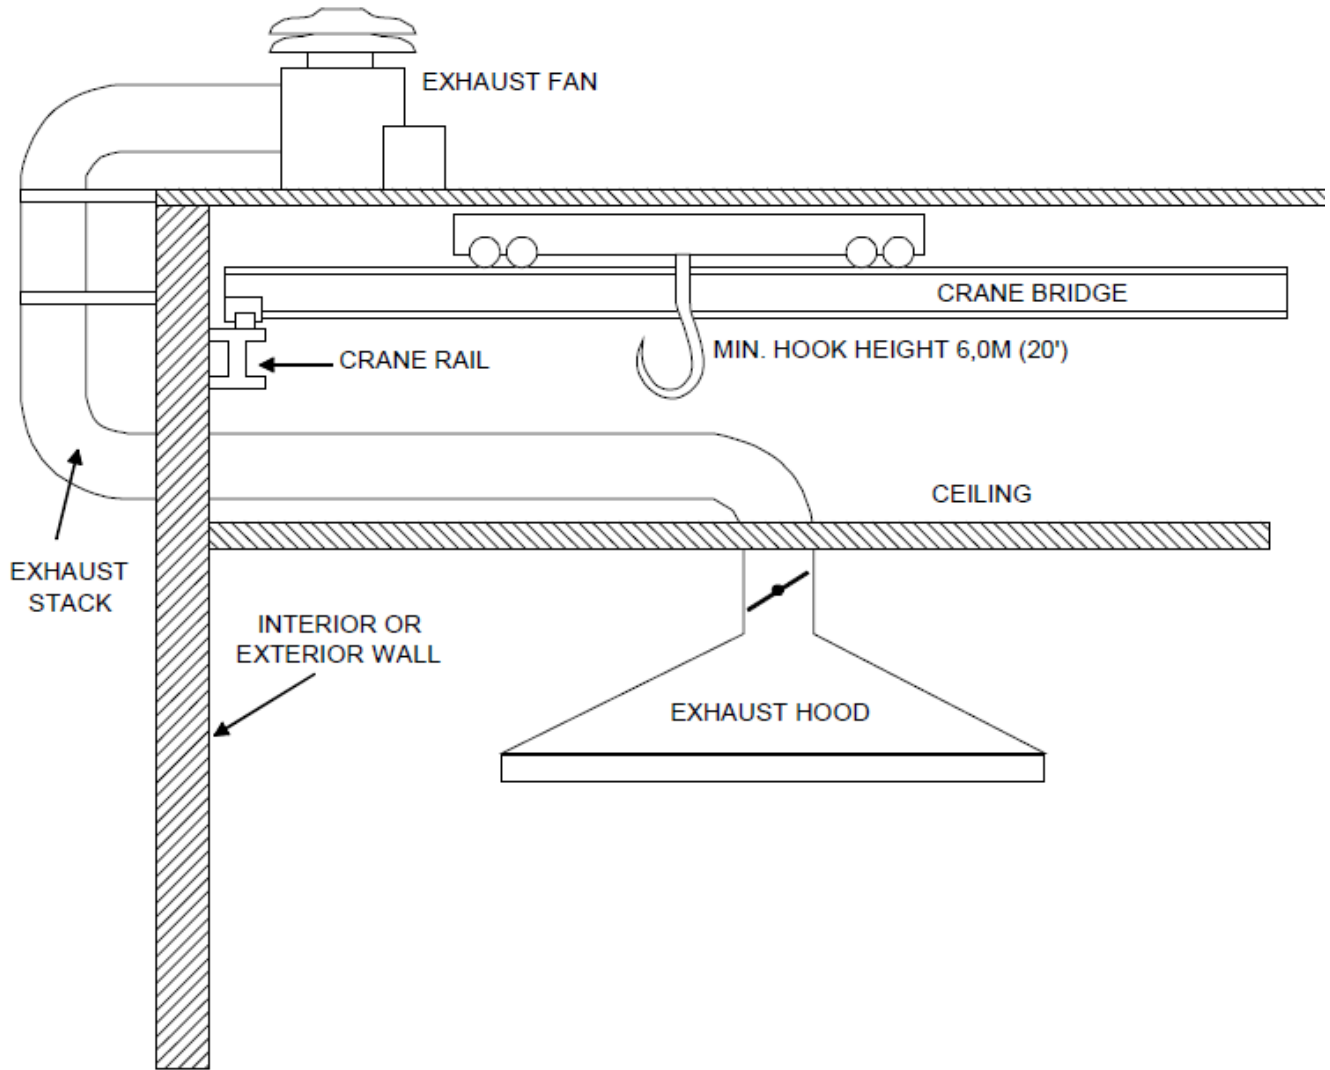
Split Exhaust Hood for Overhead Crane Travel
